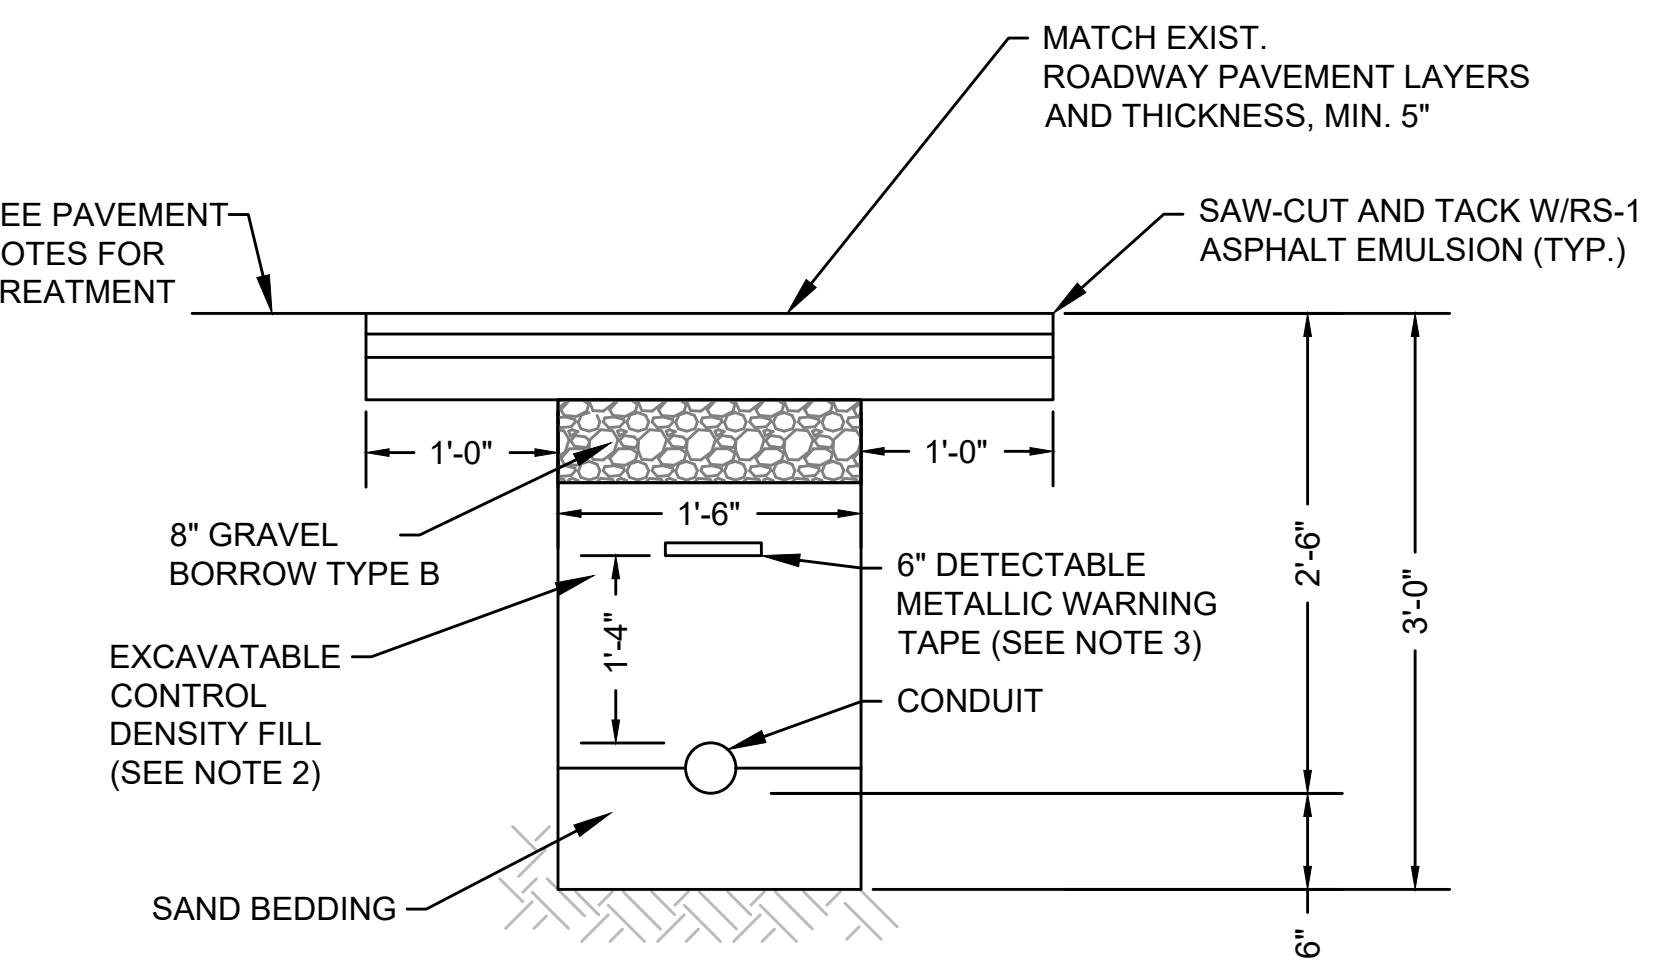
DETAIL FOR PIPE TRENCH IN MILLING AREAS NOT TO SCALE
